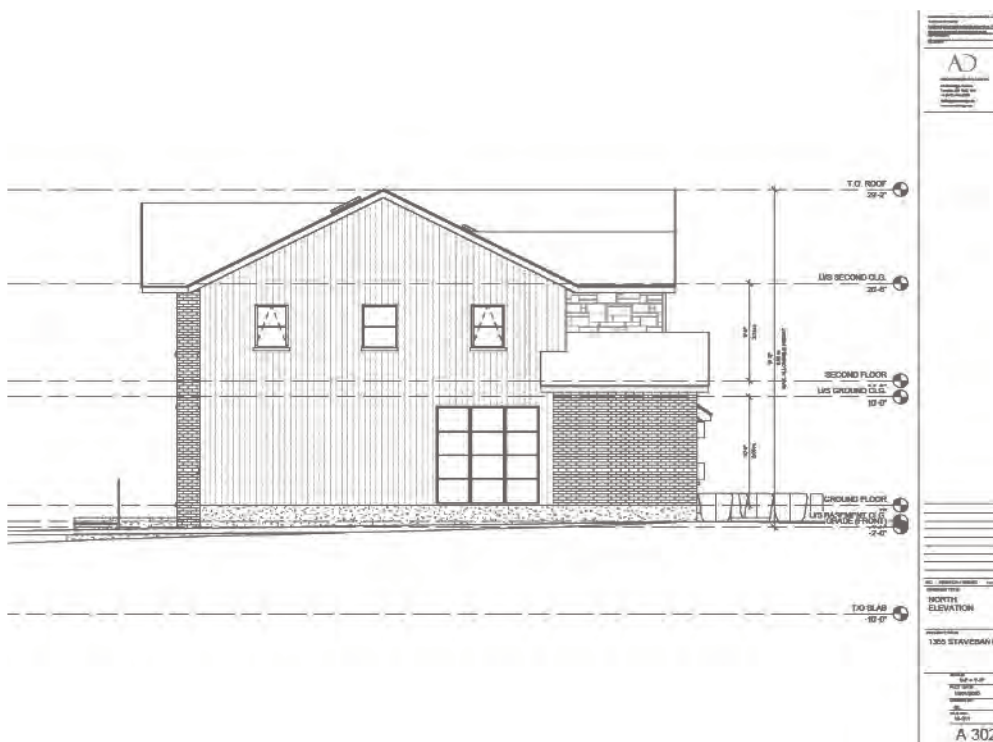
Proposed North Elevation (AEON Design Studio, Inc., 2019)
